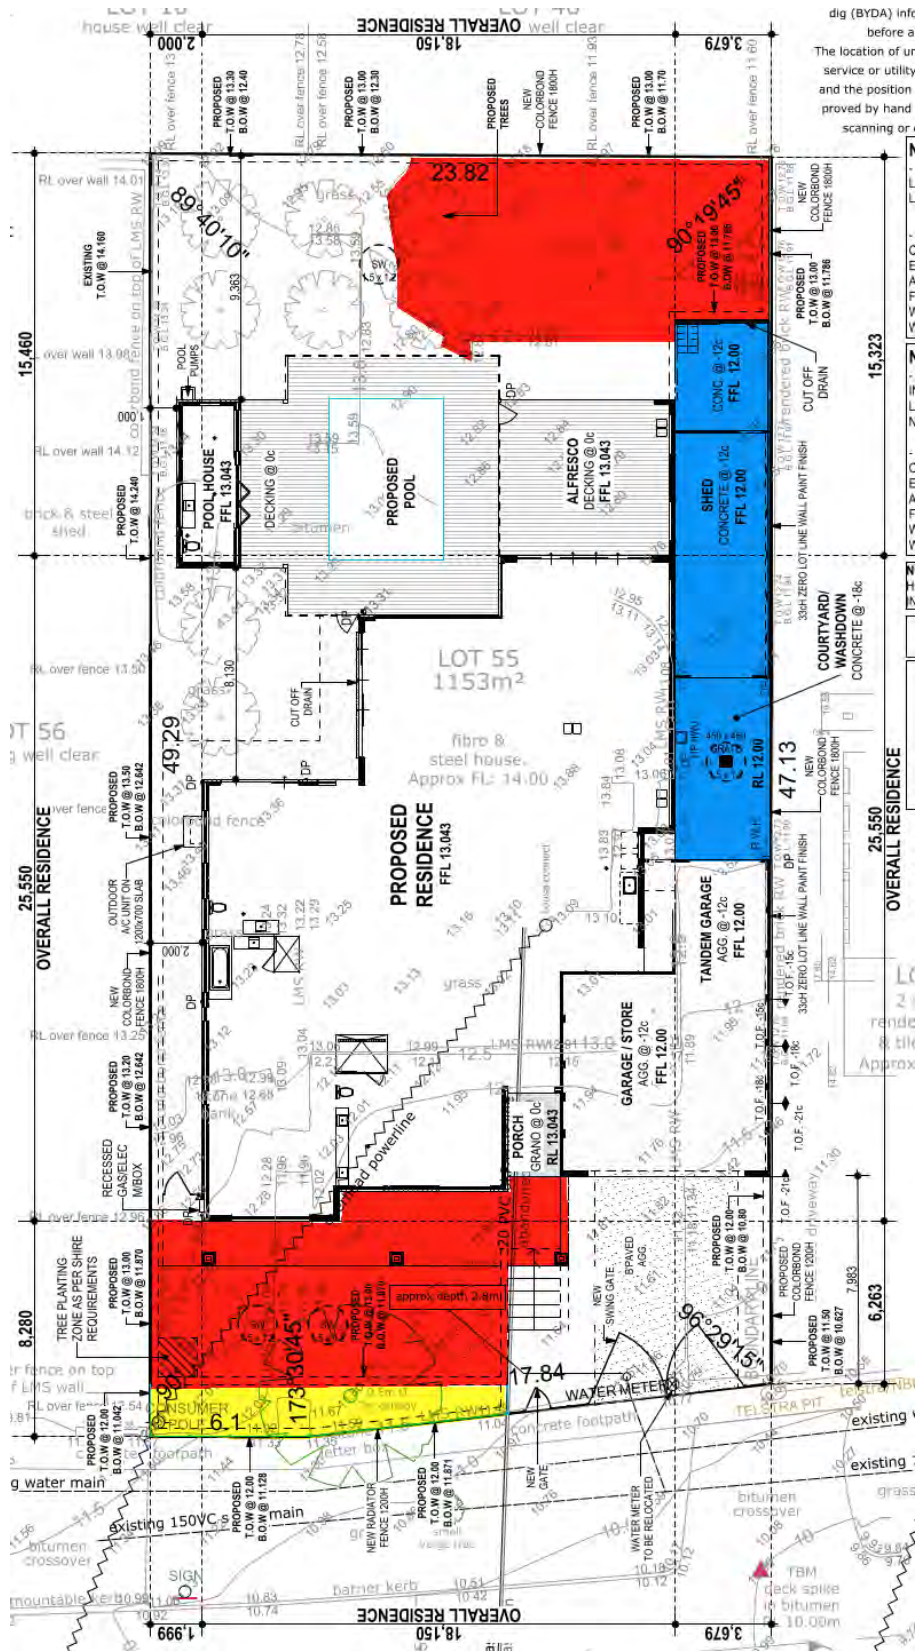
Field street identified with driveway hardstand outdoor living area running along shared boundary with 2 Field Street
